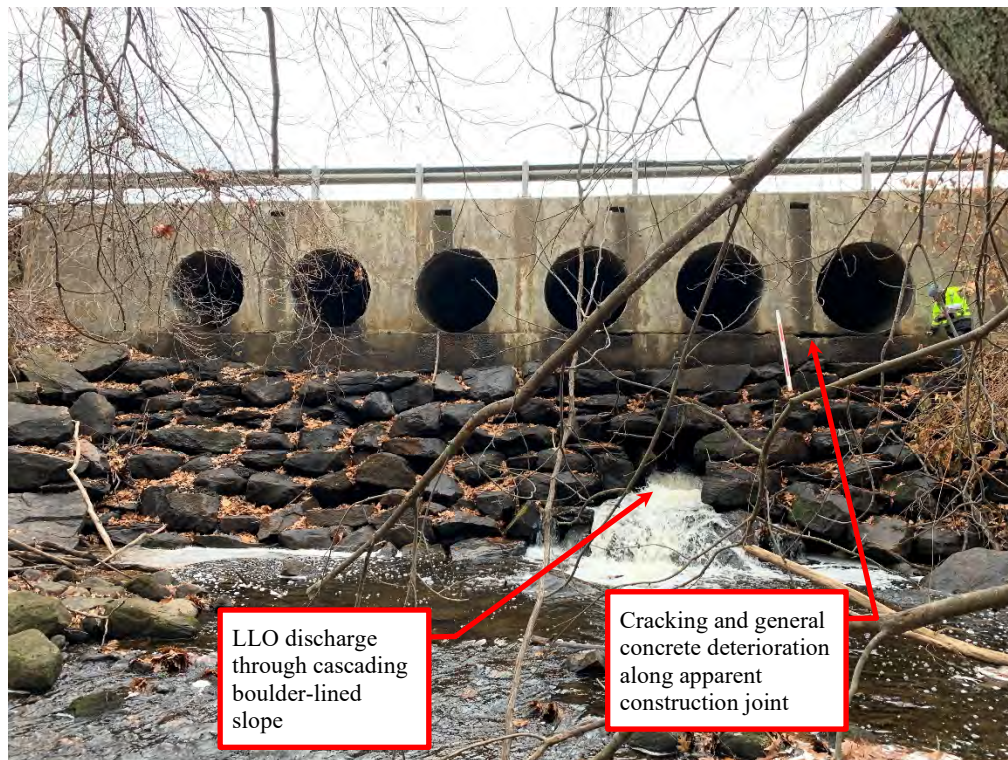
Overview of the downstream side of the spillway and cascading boulder-lined discharge slope. The spillway's reinforced concrete endwall is cracked and deteriorated in several locations.
